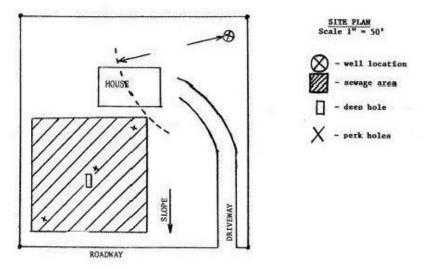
Typical Percolation Test Site Plan (dimensions to be provided by Applicant)
